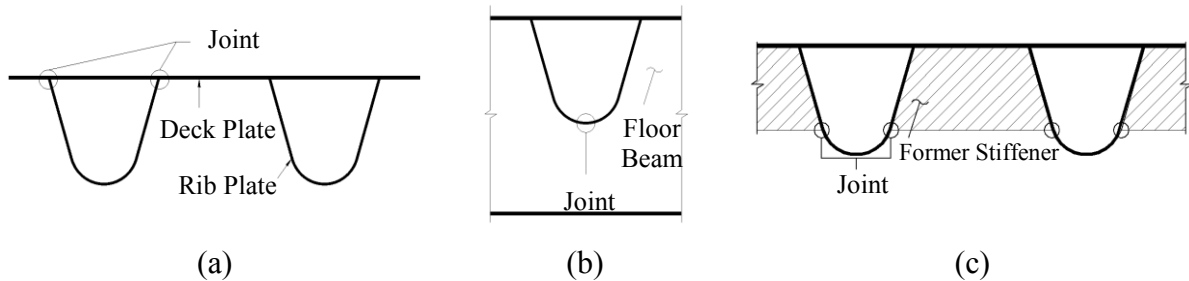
Three joints under investigation: (a) rib-to-deck joint, (b) rib-to-floor beam joint, and (c) former stiffener between adjacent stiffening ribs.
